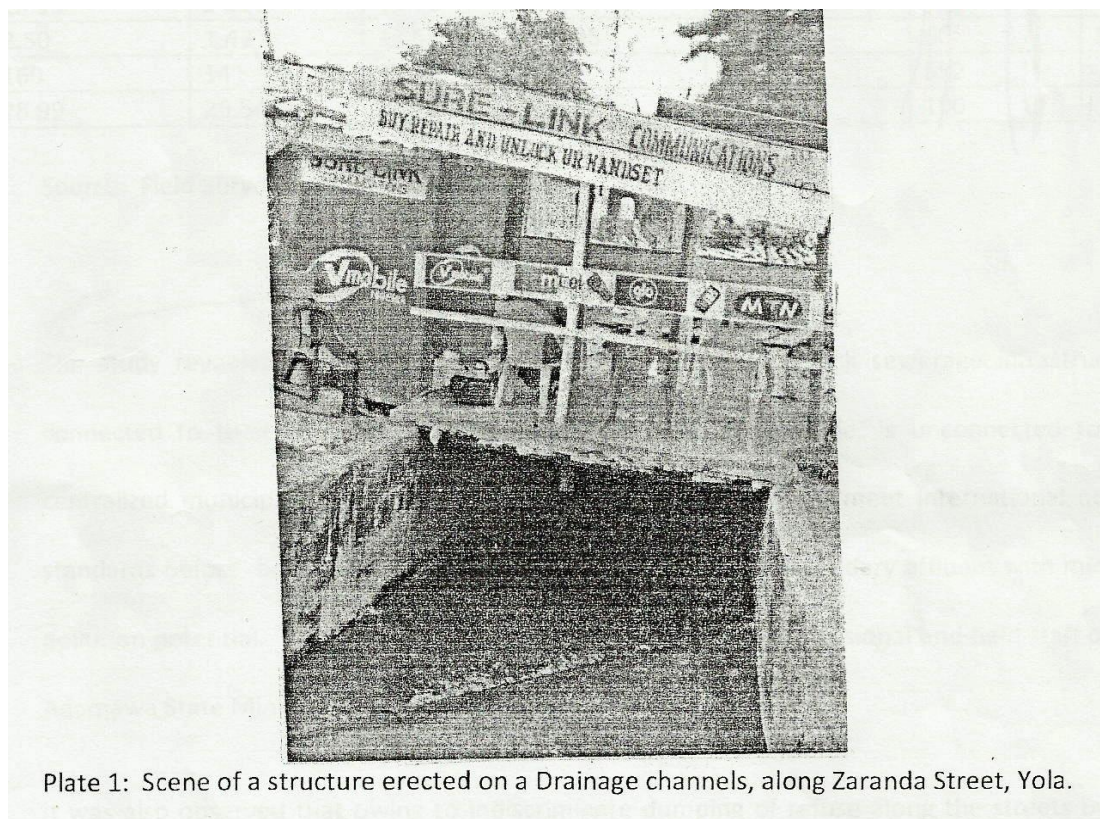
Scene of a structure erected on a Drainage channels, along Zaranda Street, Yola.
